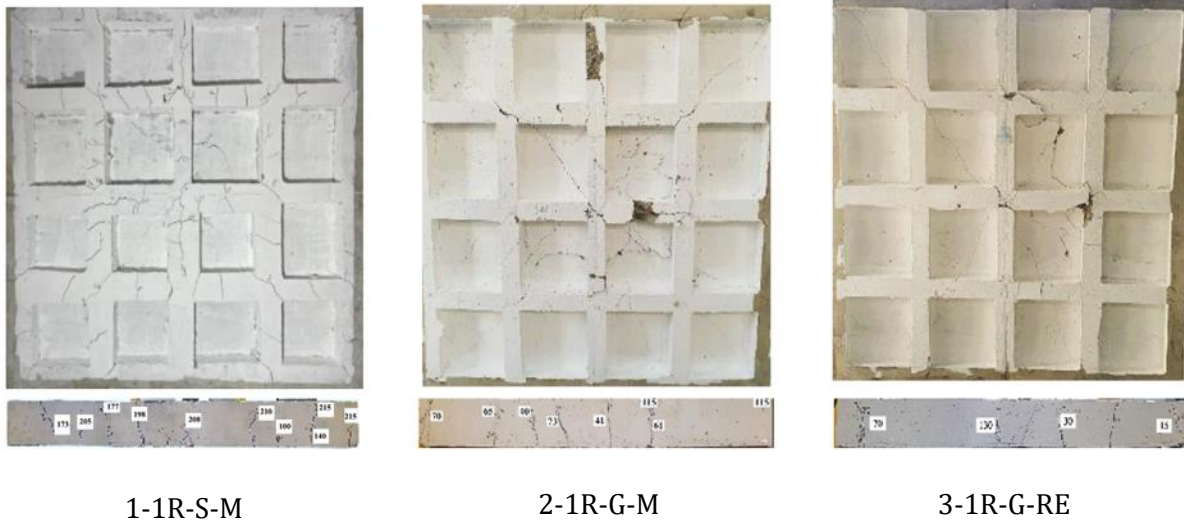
Failure modes and crack patterns of ribbed slab specimens at the ultimate stage
